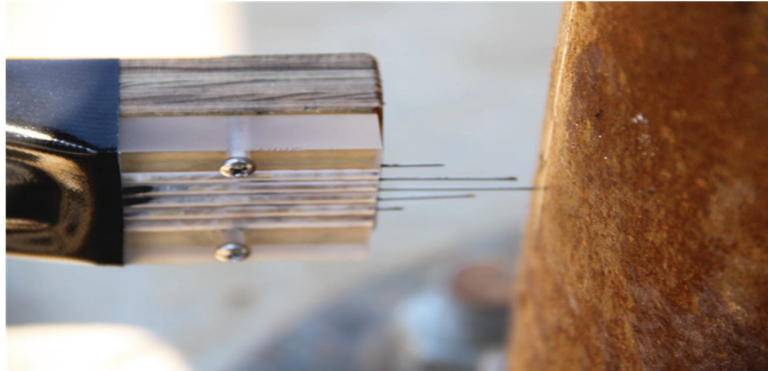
Close Up View of the Pin Assembly on Specimen MSJC1
